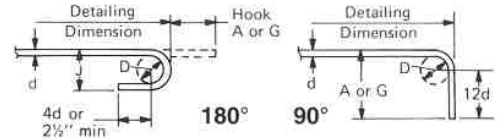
Standard Deformed Reinforcing Bars (Source: Concrete Reinforcing Steel Institute)
